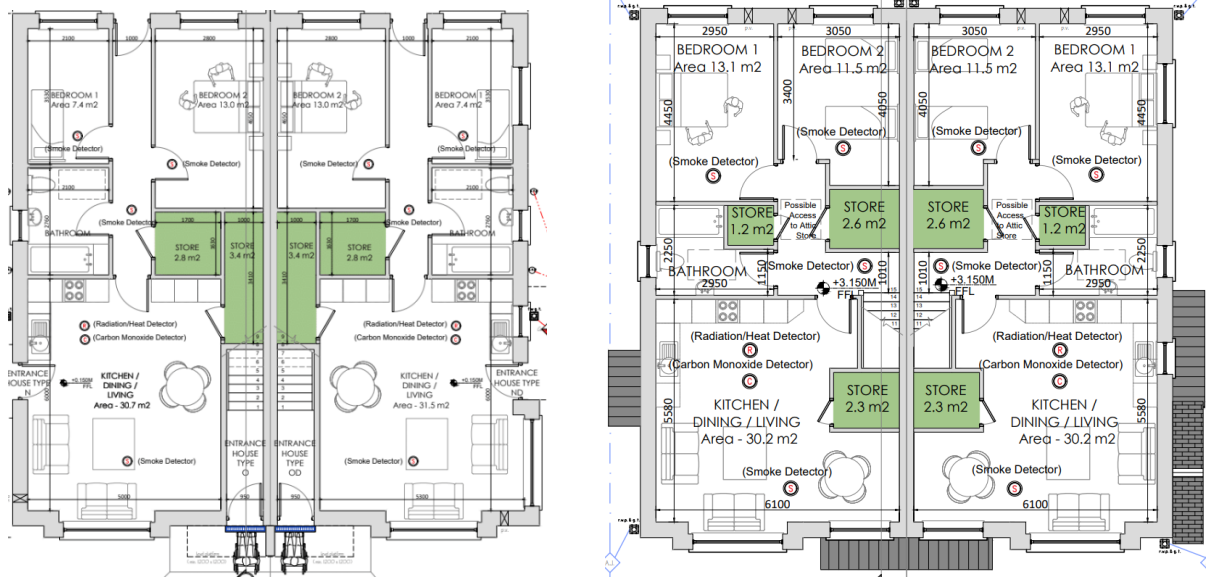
Ground floor plan (left) and first floor plan (right) of Maisonette-Types N & ND / O / OD
